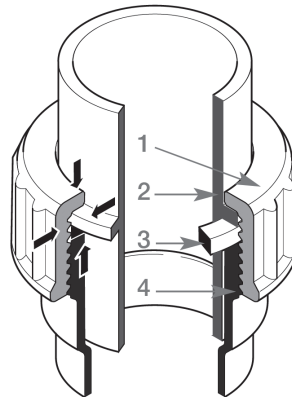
Screw-threaded joint with flange bushing (available  $\varnothing$  40–110 mm)
